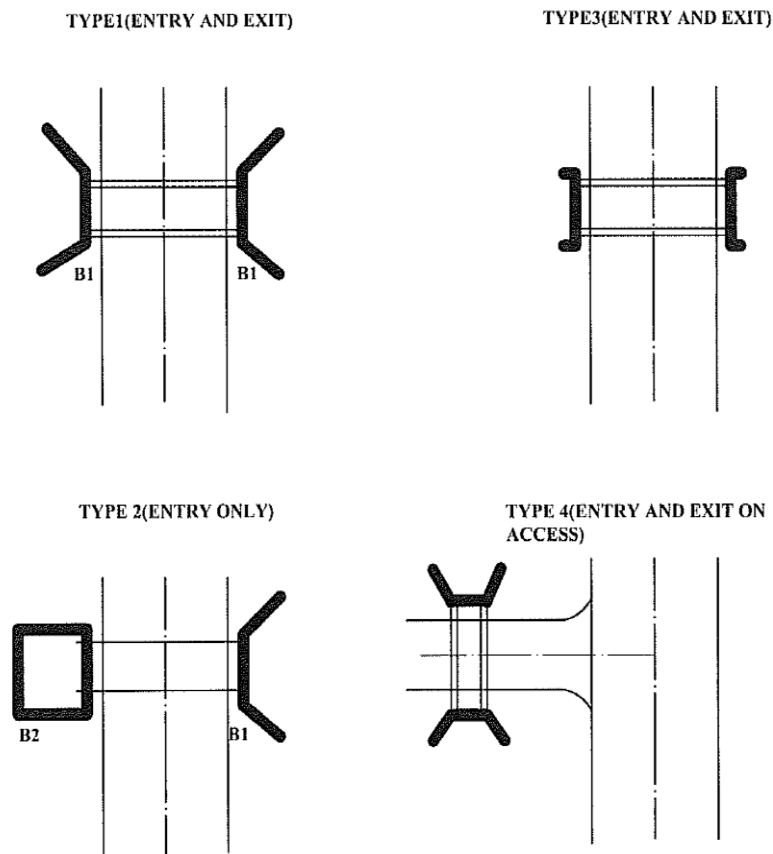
CULVERT ENTRY/EXIT STRUCTURE TYPES
